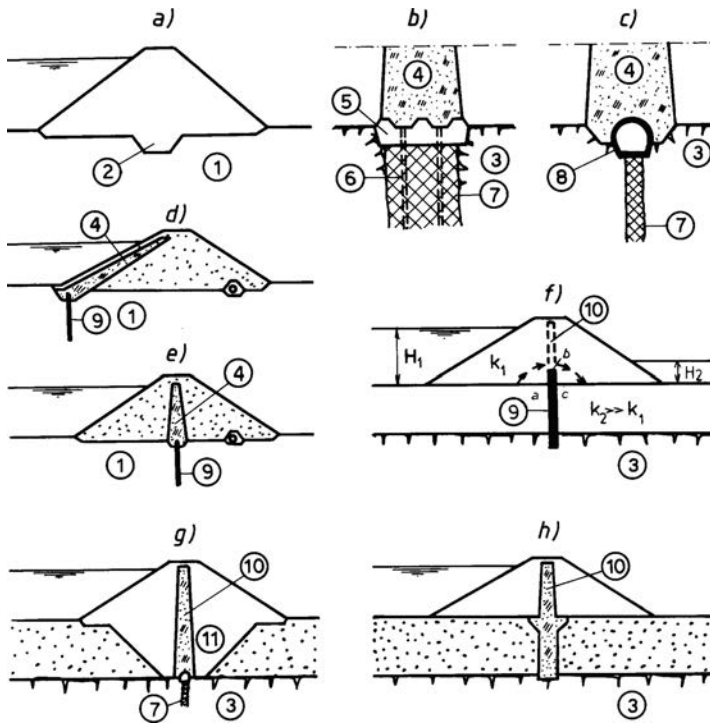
Joint between an earthfill dam and its foundation. (1) Impervious earth foundation; (2) cut-off trench; (3) rock; (4) core (or facing); (5) concrete slab; (6) grout hole; (7) grout curtain; (8) grouting gallery; (9) sheet piling barrier (or concrete wall); (10) core or diaphragm wall; (11) construction pit.
